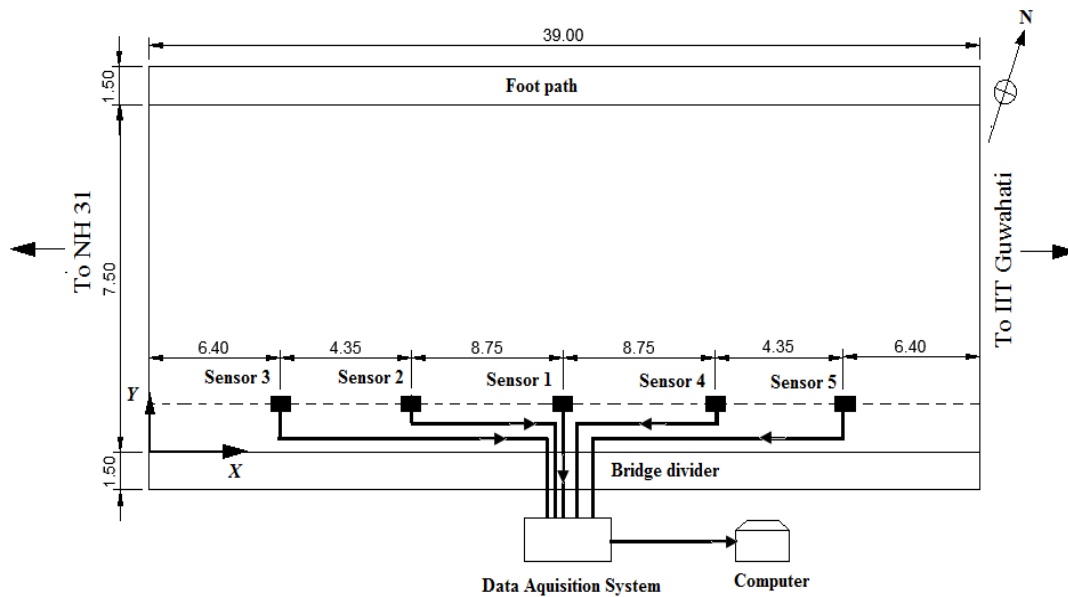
Layout of bridge instrumentation (All dimensions are in m)
